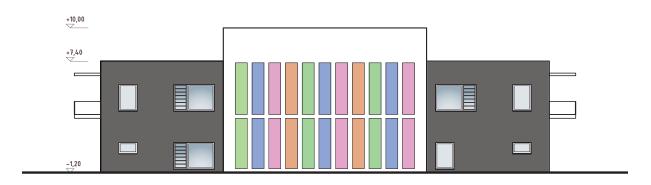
FACADE TOWARDS NORTH, SCALE 1:250.
